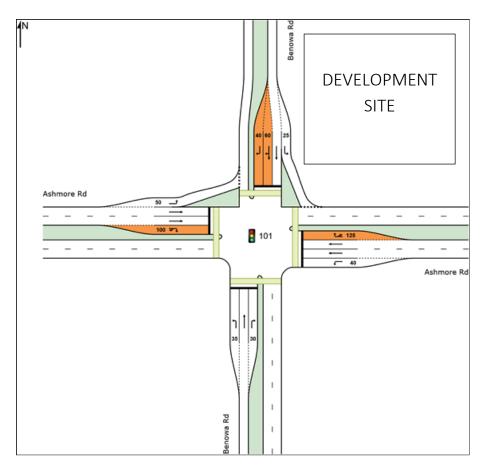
Ashmore Road / Benowa Road Intersection (Upgraded Configuration) – SIDRA Layout
